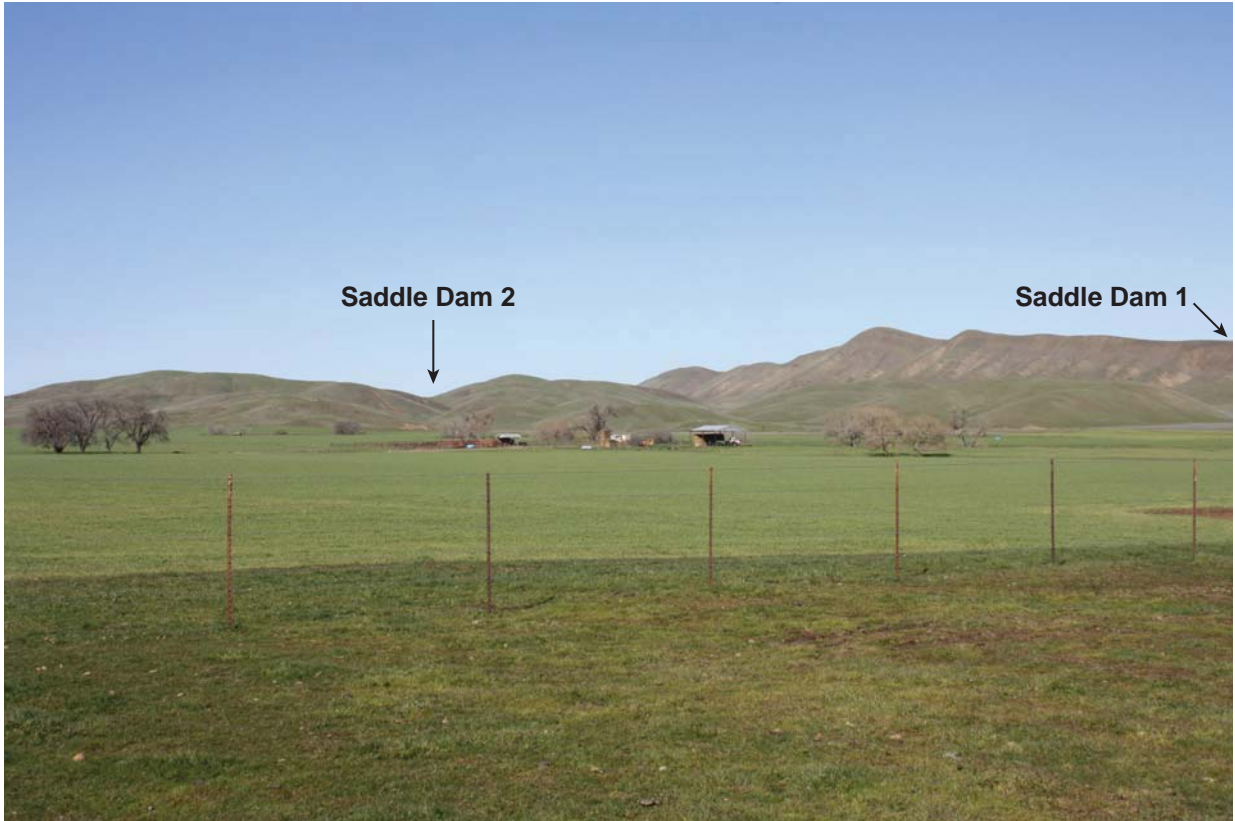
Looking north from Peterson Road toward Saddle Dams 1 and 2 locations from inside of the inundation area. Saddle Dam 1 would be located immediately adjacent to Logan Ridge on the right side of the photo. Saddle Dam 2 would be located to the left of center of the photo.
